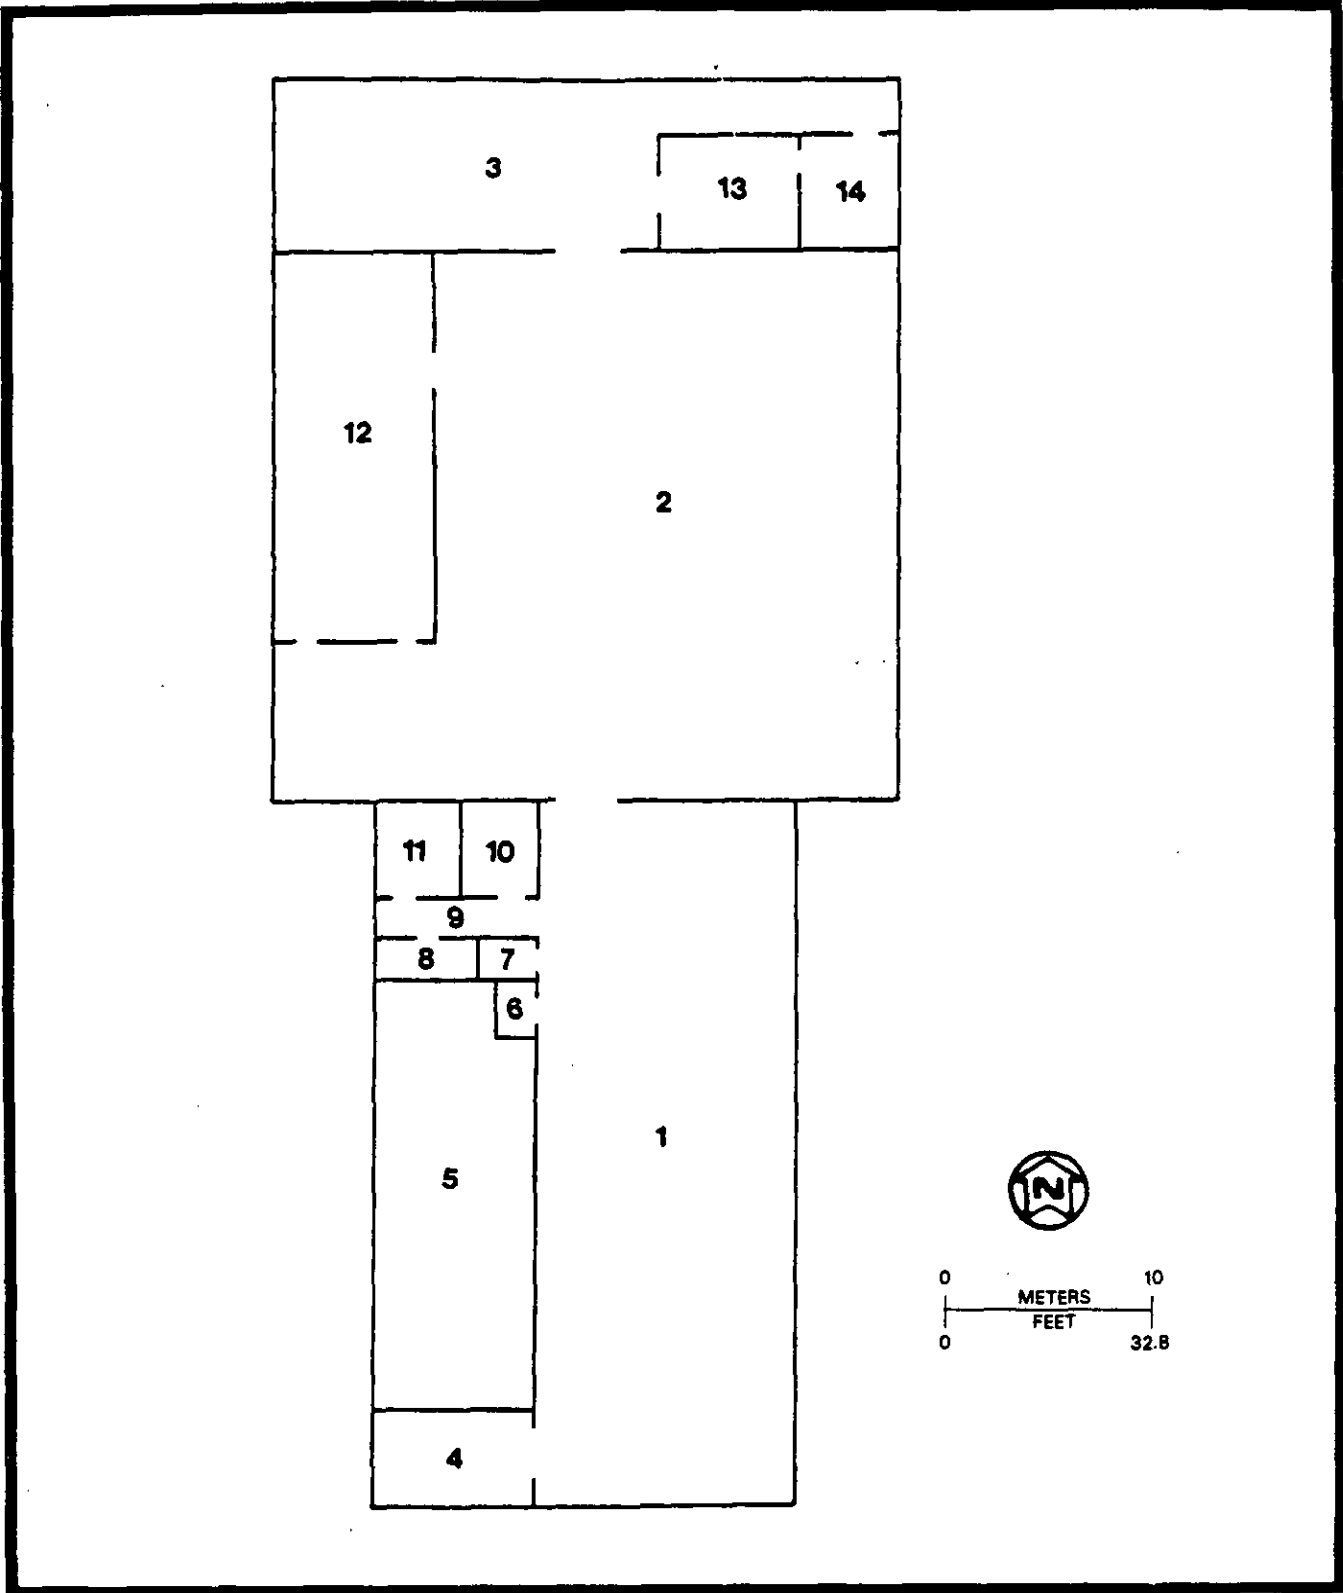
PLAN OF WAREHOUSE INDICATING ROOM DESIGNATIONS FOR SURVEY REFERENCE
